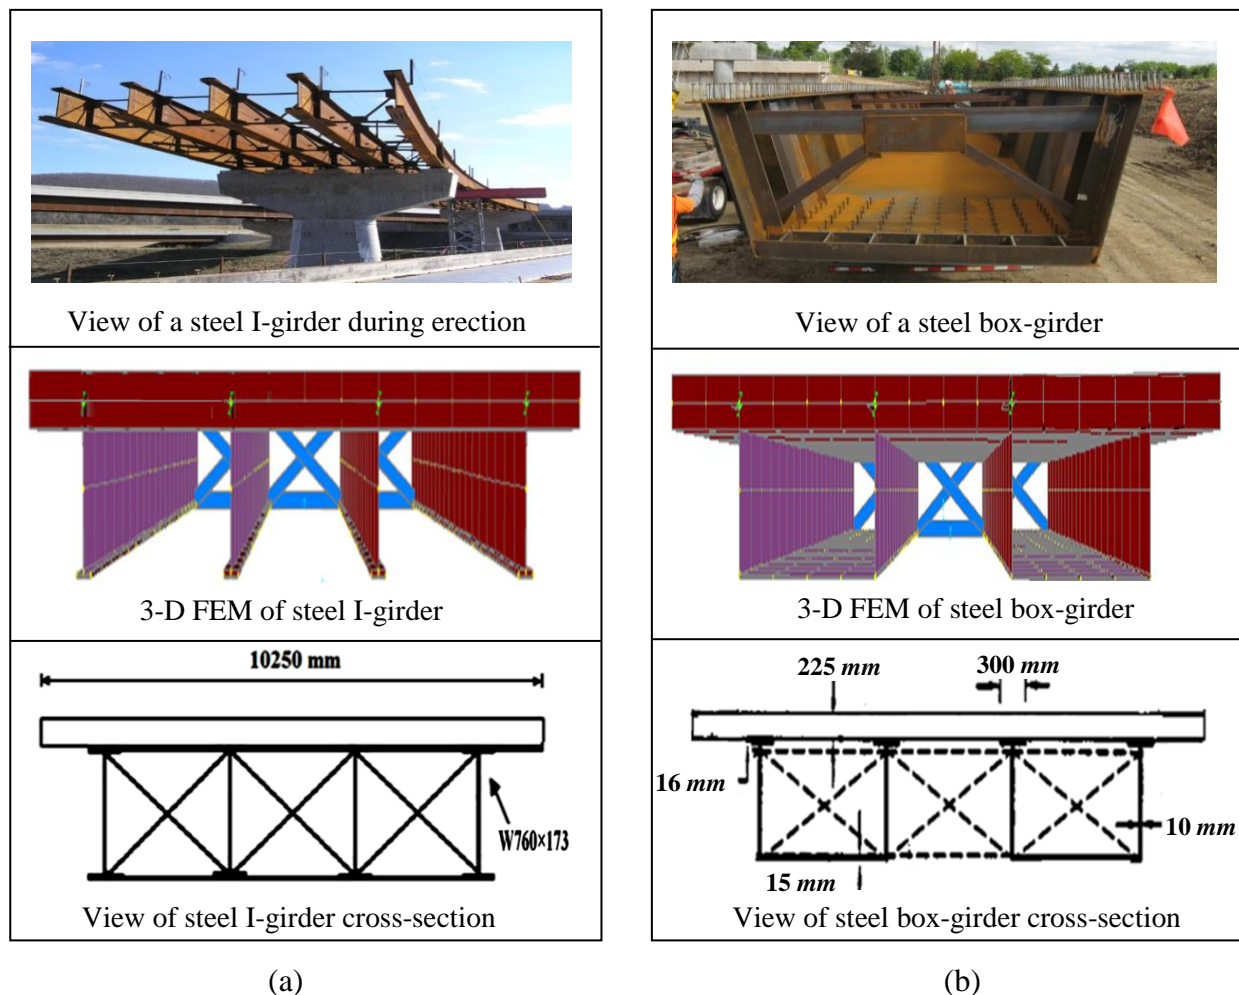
View of (a) Steel I-girder, (b) Steel box-girder.
